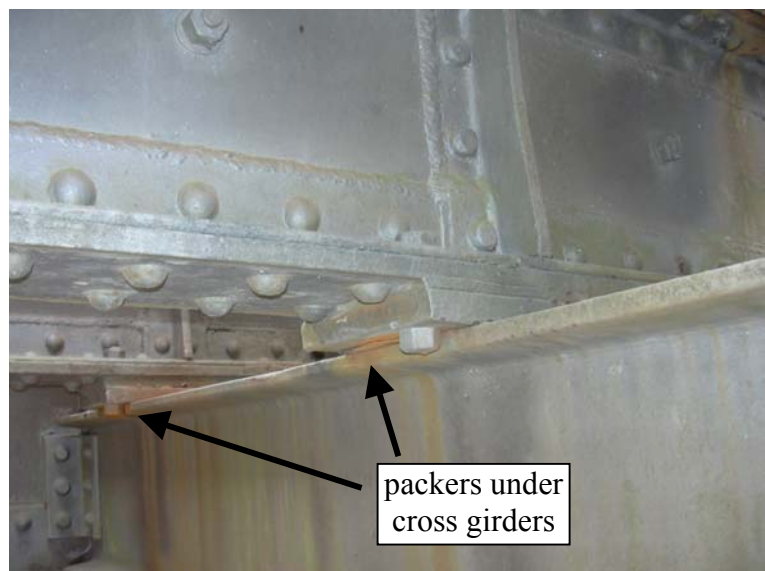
Steel stringer connects to primary cross girder(left), supports secondary cross girders
